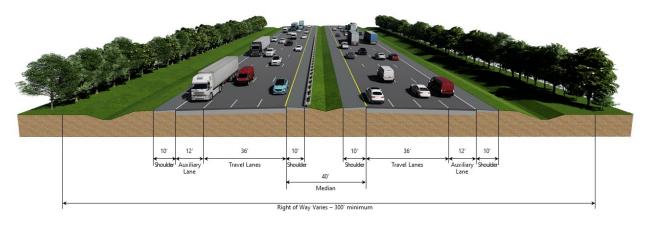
I-95 Typical Section from Philips Highway (US 1) to Southside Boulevard
